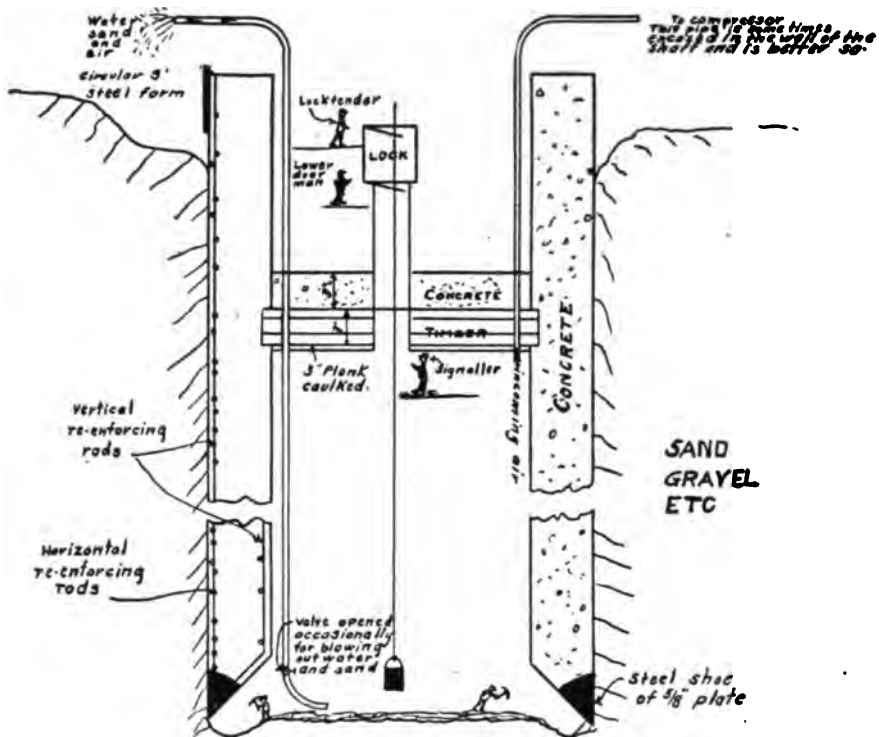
SCETCH OF SHAFT SINKING OPERATION.
